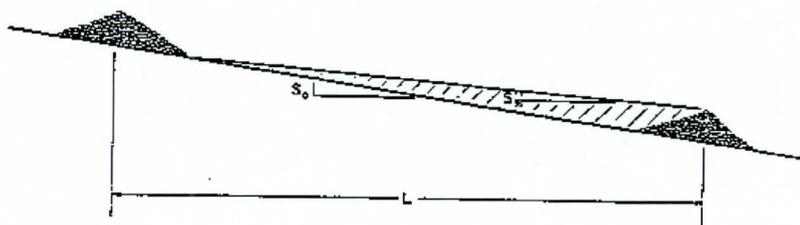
Spacing of grade control structure (from Mussetter 1982)
